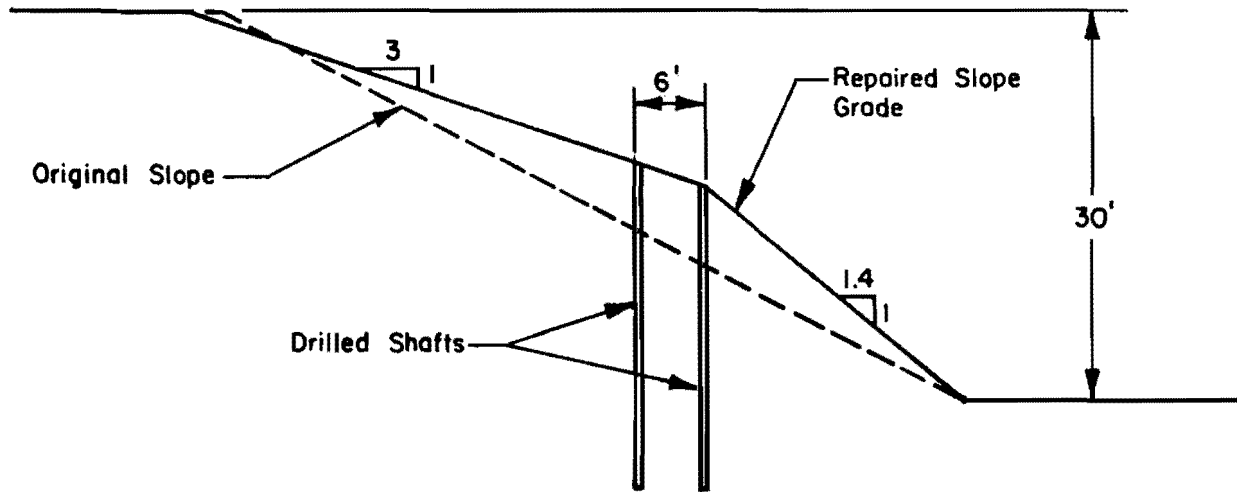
Typical cross section of Boggy Creek near U.S. 183 in southeast Austin.
